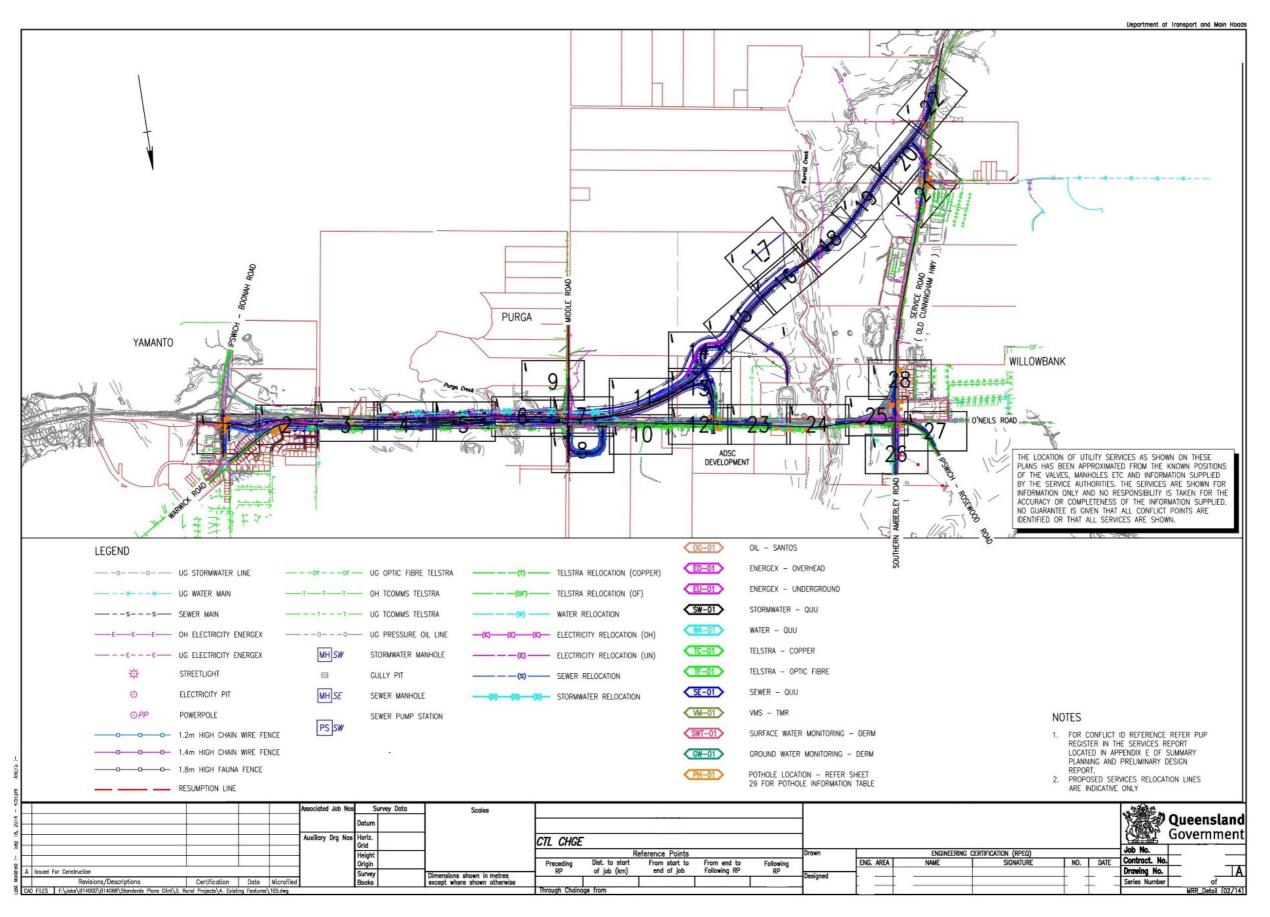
(b) – Existing features plan with PUP potholing information – generic example sheet 2 of 3
